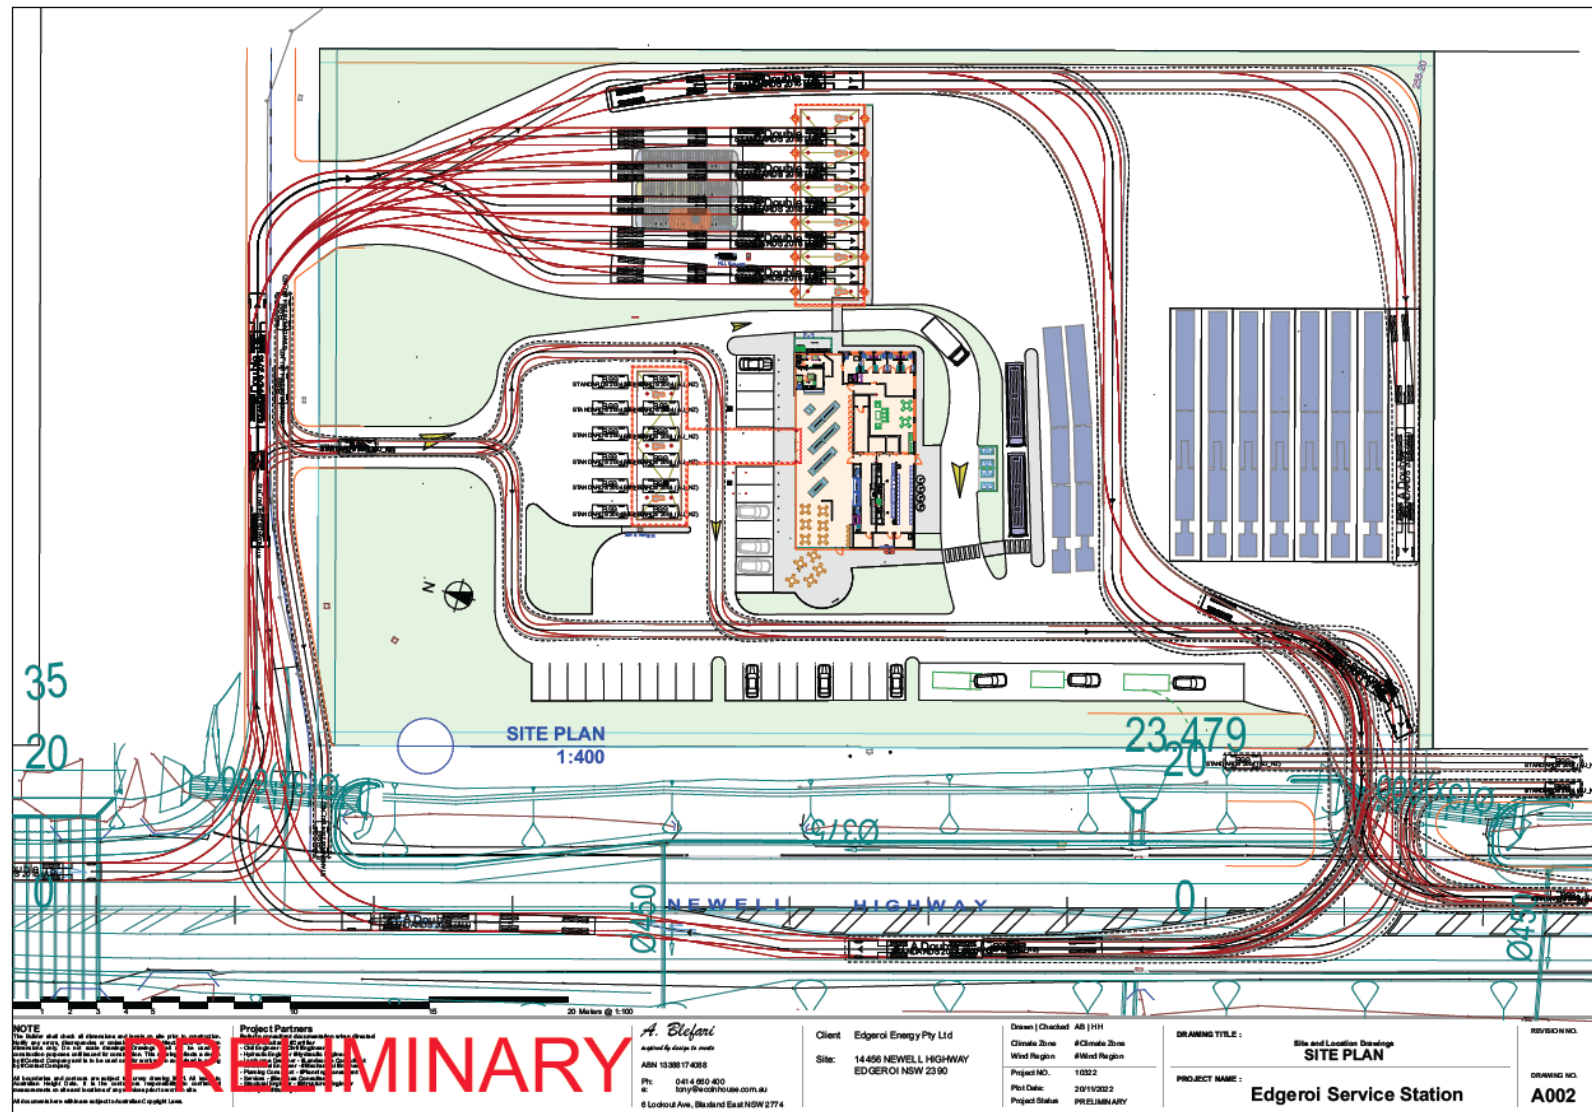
Preliminary Layout of Proposed Edgeroi Service Station site
